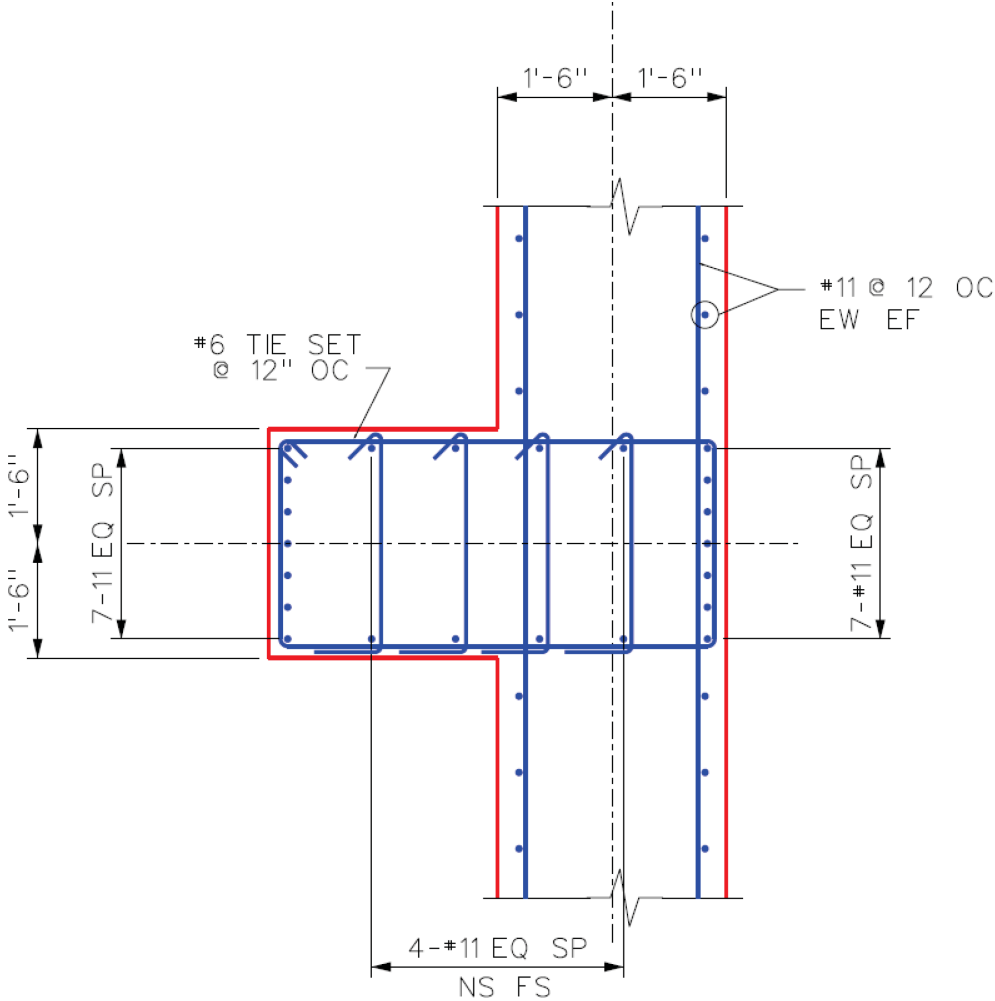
B-81: CRB Reinforcement Detail for Pilaster Type 1
